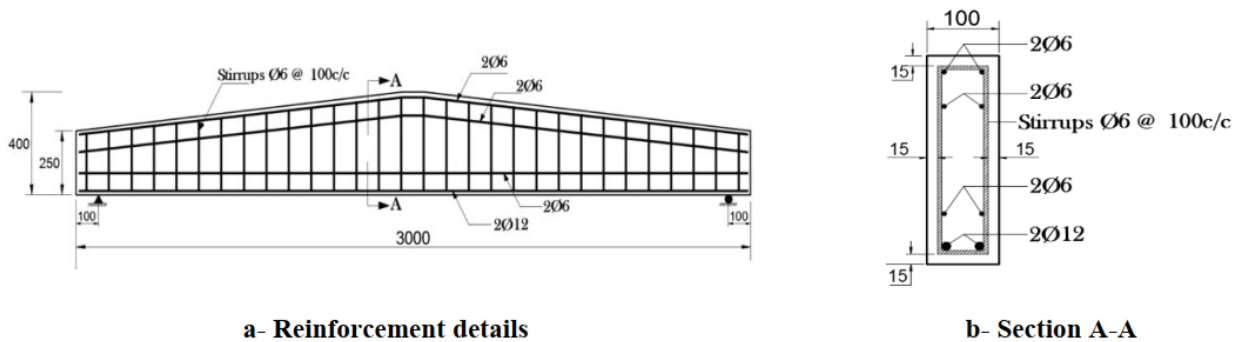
Details of reinforcement for solid gable beam (all dimensions are in mm).
